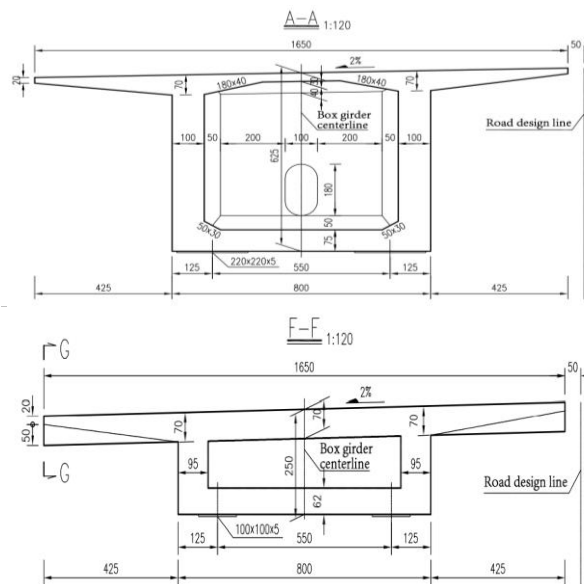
The standard cross section of the bridge box girder (unit: cm)
